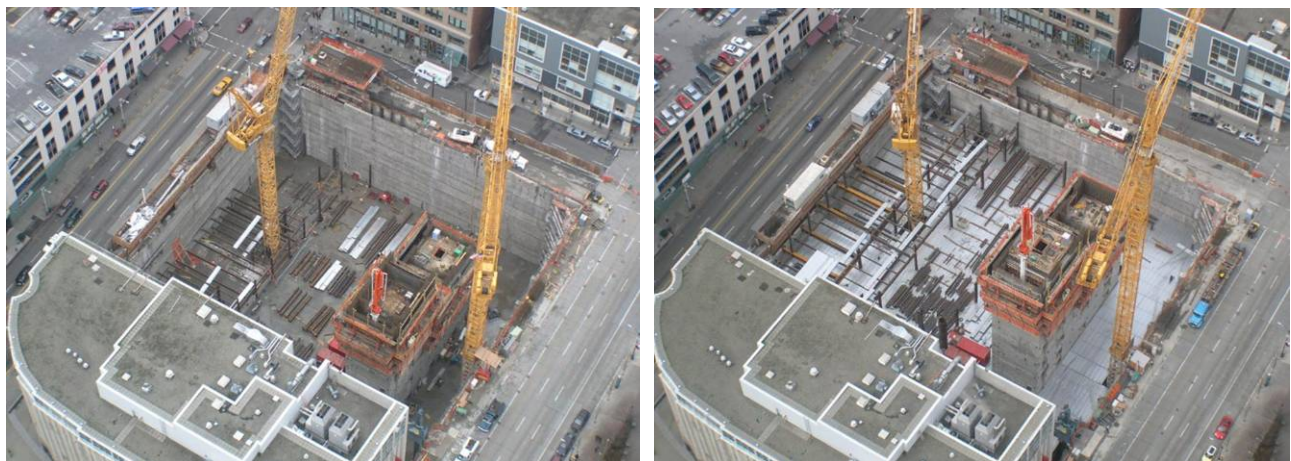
Construction of a concrete core and below-grade levels of a high-rise building (courtesy of Magnusson Klemencic Associates).
